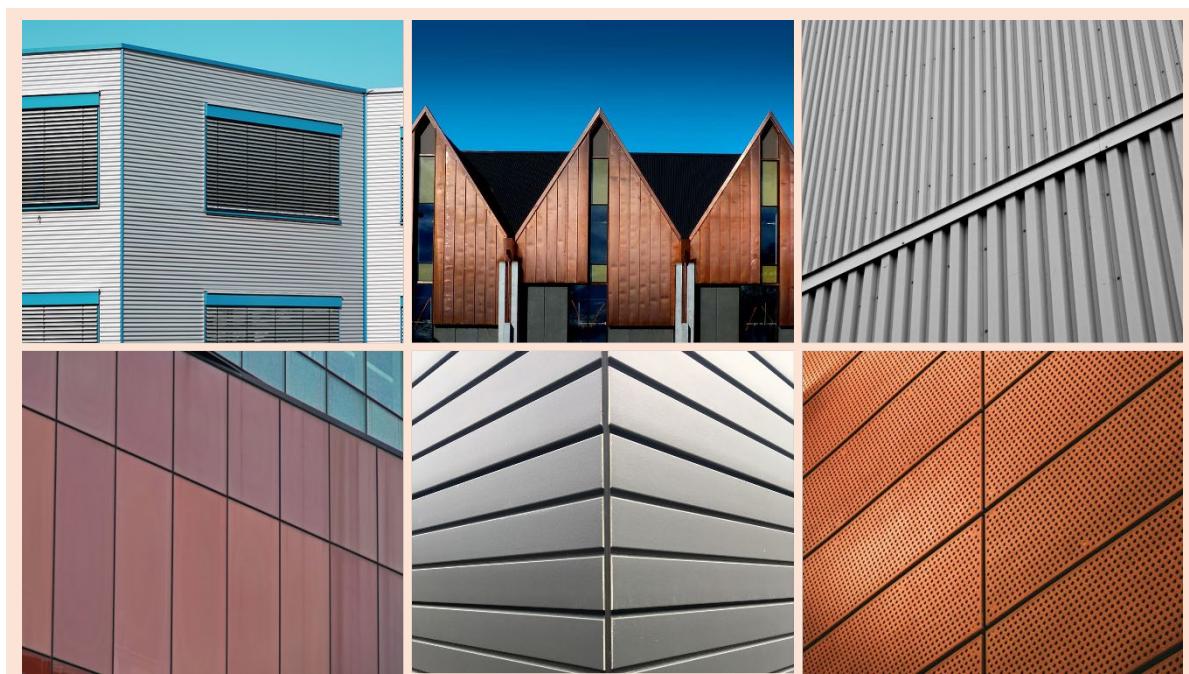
Examples of external walls with metal façade. All images are public domain.
